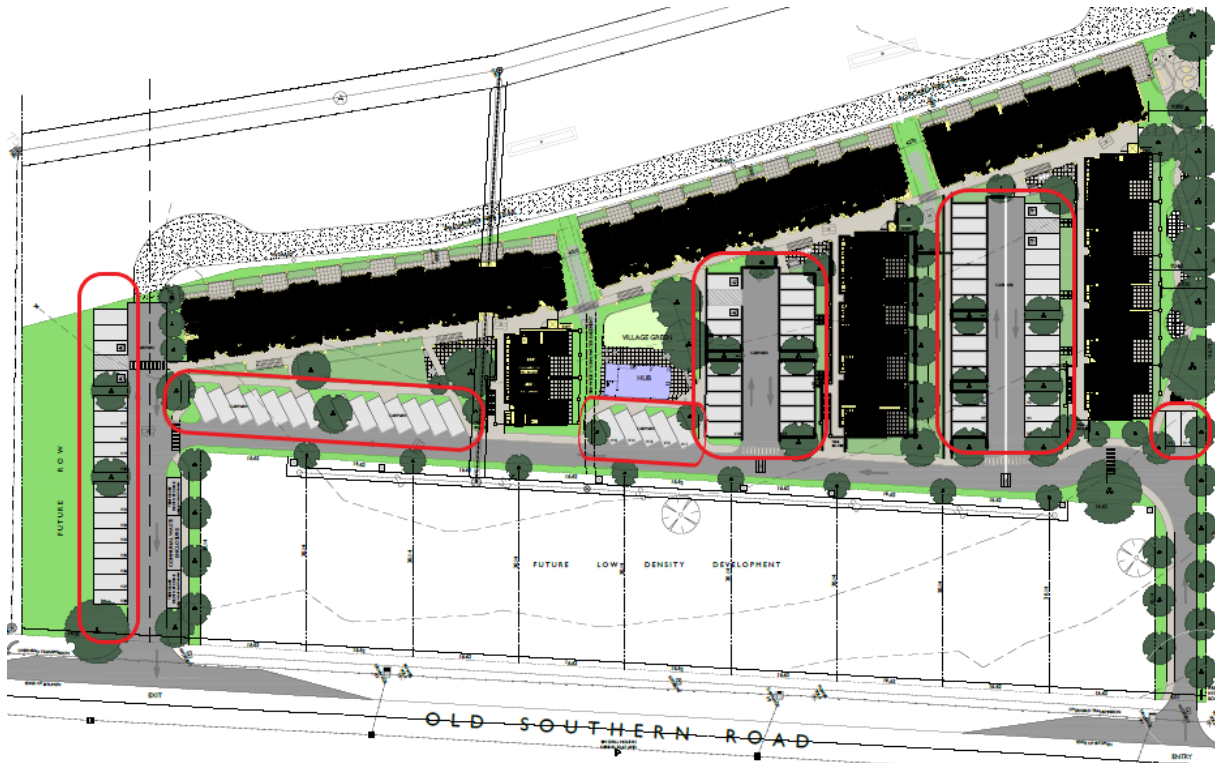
Site Plan highlighting proposed parking areas (See also Attachment 4 (Landscaping) to this report)
